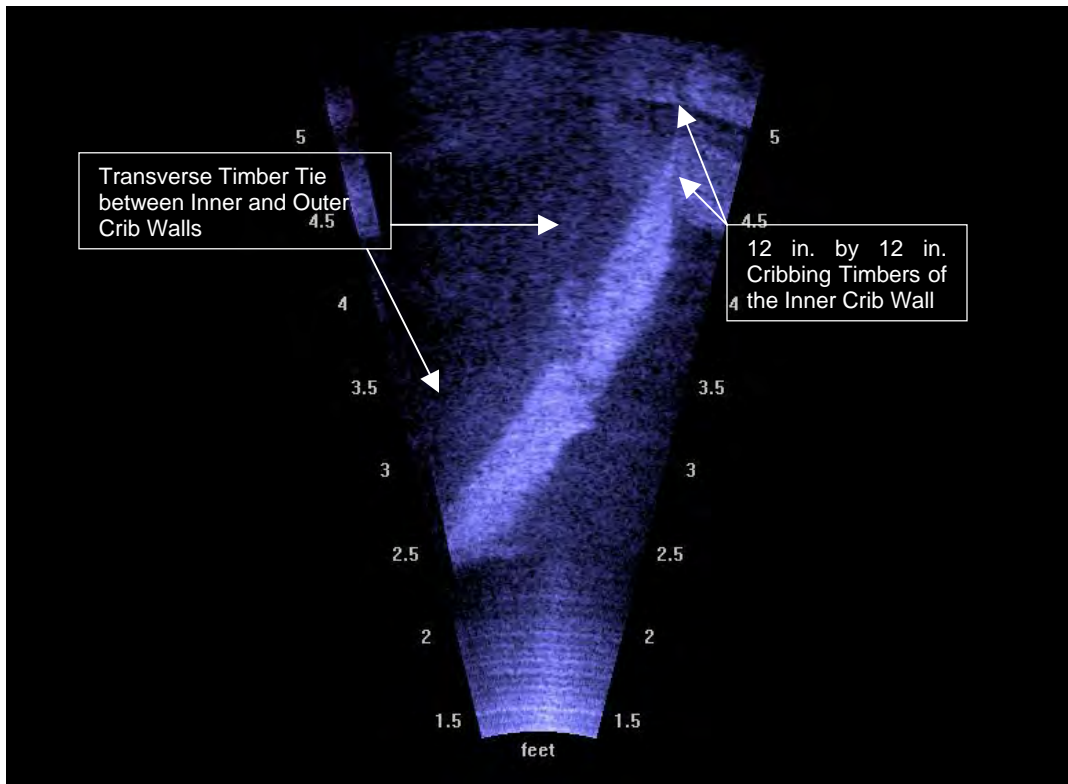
Sonar image showing transverse timber tie and inner wall in place.
